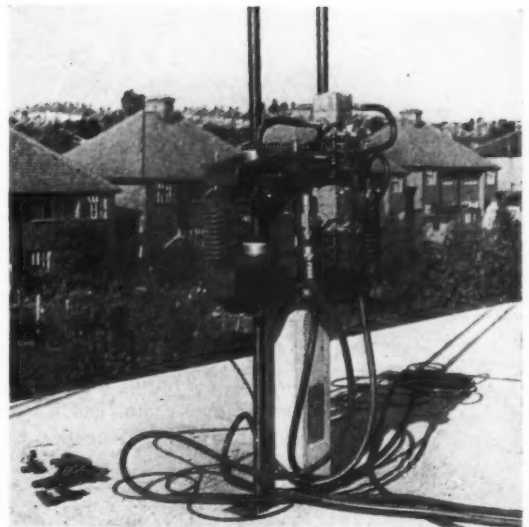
The hydraulic jack used for slab lifting. This one is shown on top of a concrete column at the lift slab store building erected by the builders in their own yard immediately before the Birmingham flats project.
